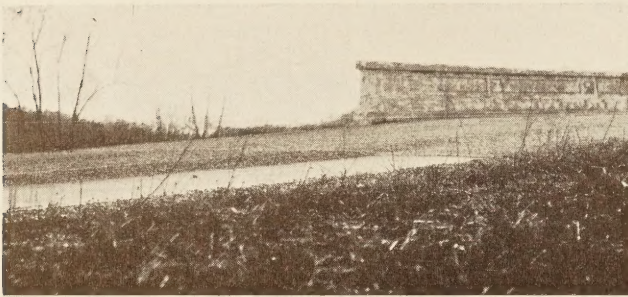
IMPACT REACTIONS PRODUCED ON A CONCRETE BRIDGE BY THE SHARP RISE TO THE BRIDGE FROM A ROAD AT A LOWER GRADE
